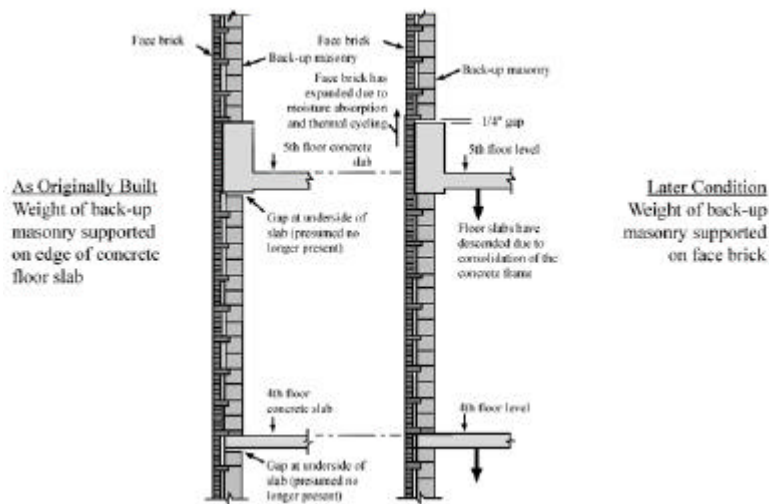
Expansion of brick outer wythe lifted back-up masonry off structure
